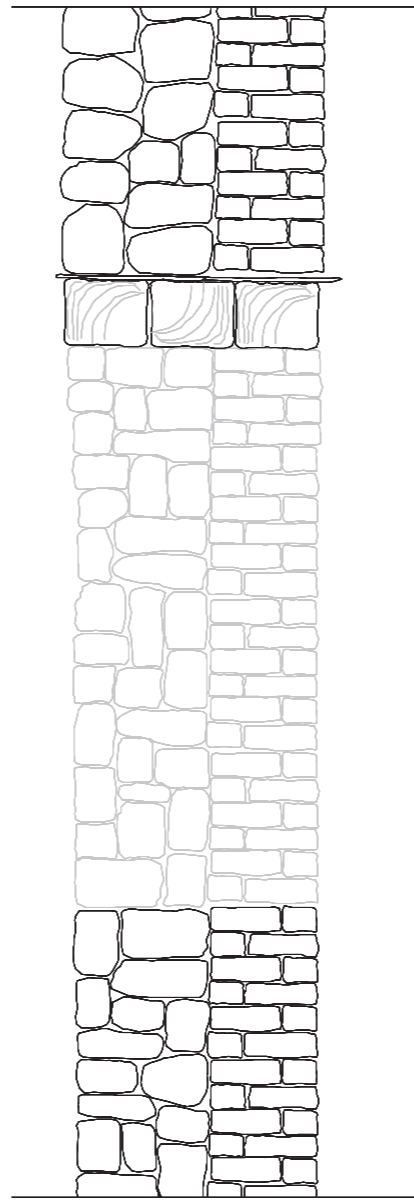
Bressumer Beam (200x200) used to half the span of the joists. Joists Tongued and Grooved to the beam.
